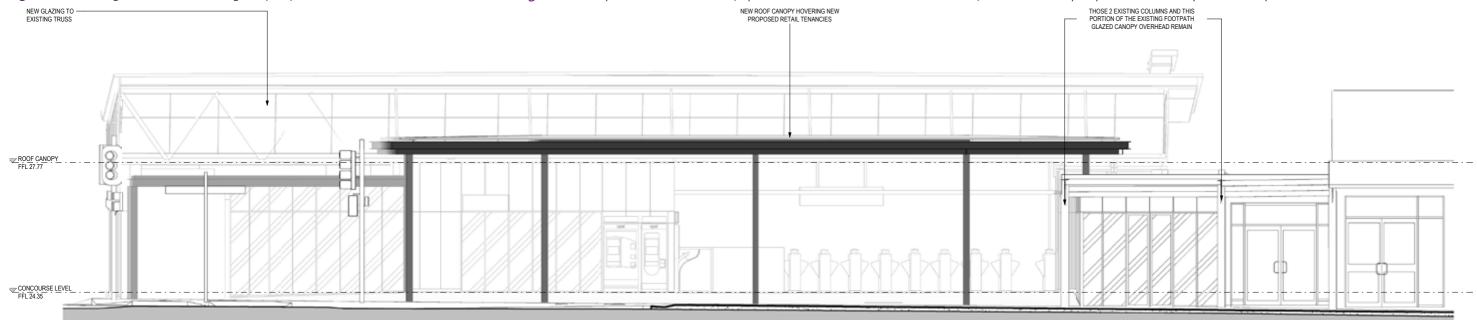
Beamish Street elevation - new proposed entrance setout
